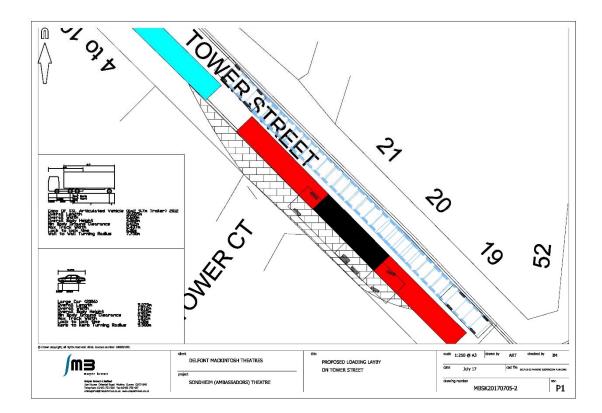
Option 1b Swept Path of a 12.685m (With 9.7m Trailer) Artic vehicle to Loading Location on Tower Street
